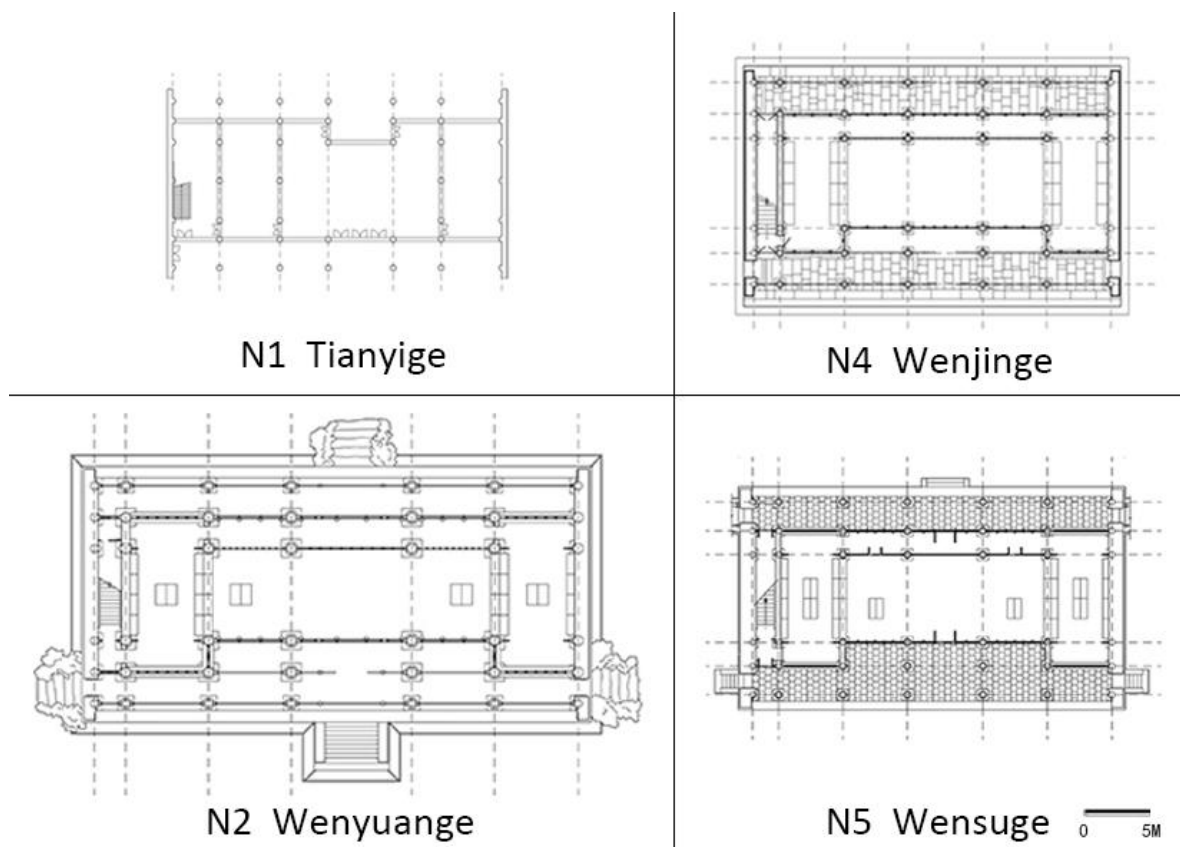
Ground Floor Plan of N1, N2, N4, N5.
